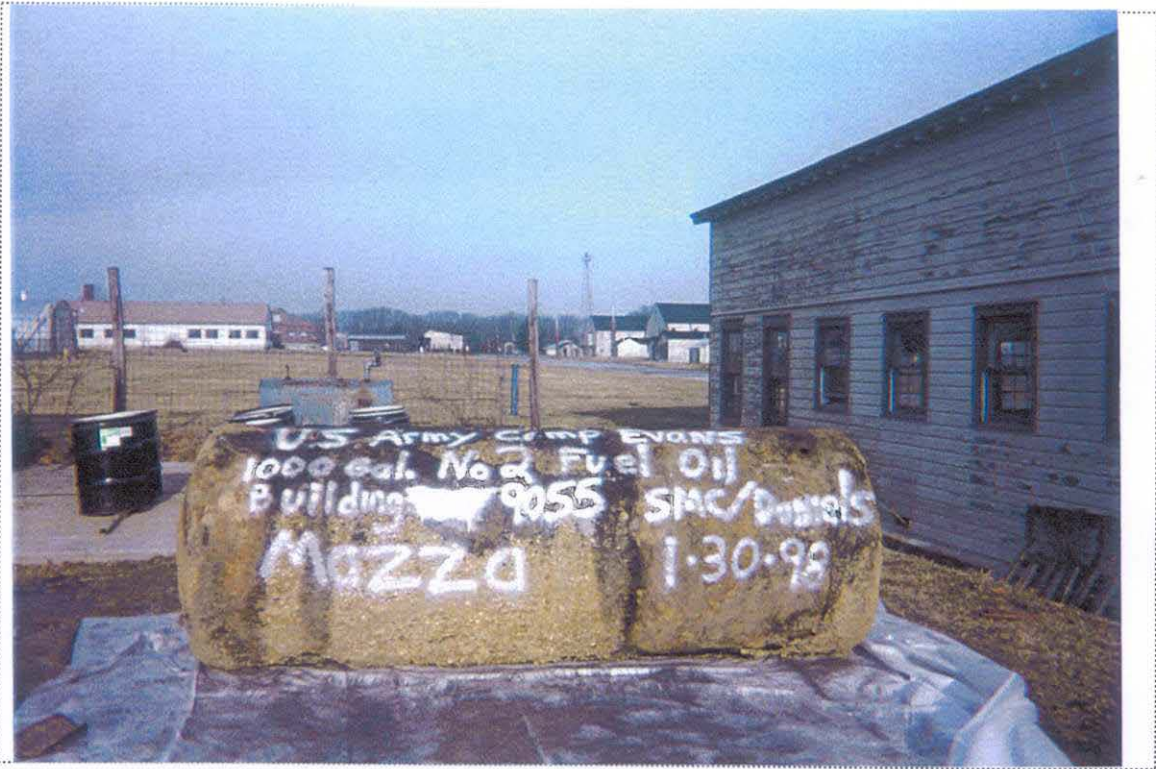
View of UST-9055 staged on the west side of Building 9061 awaiting disposal and labeled with all required information.
